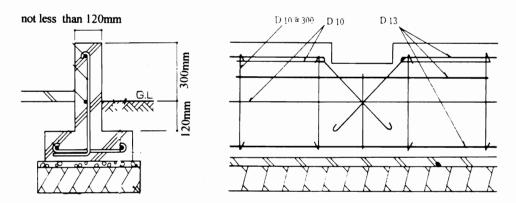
Foundation Wall in Japan (Abe, 1984)
